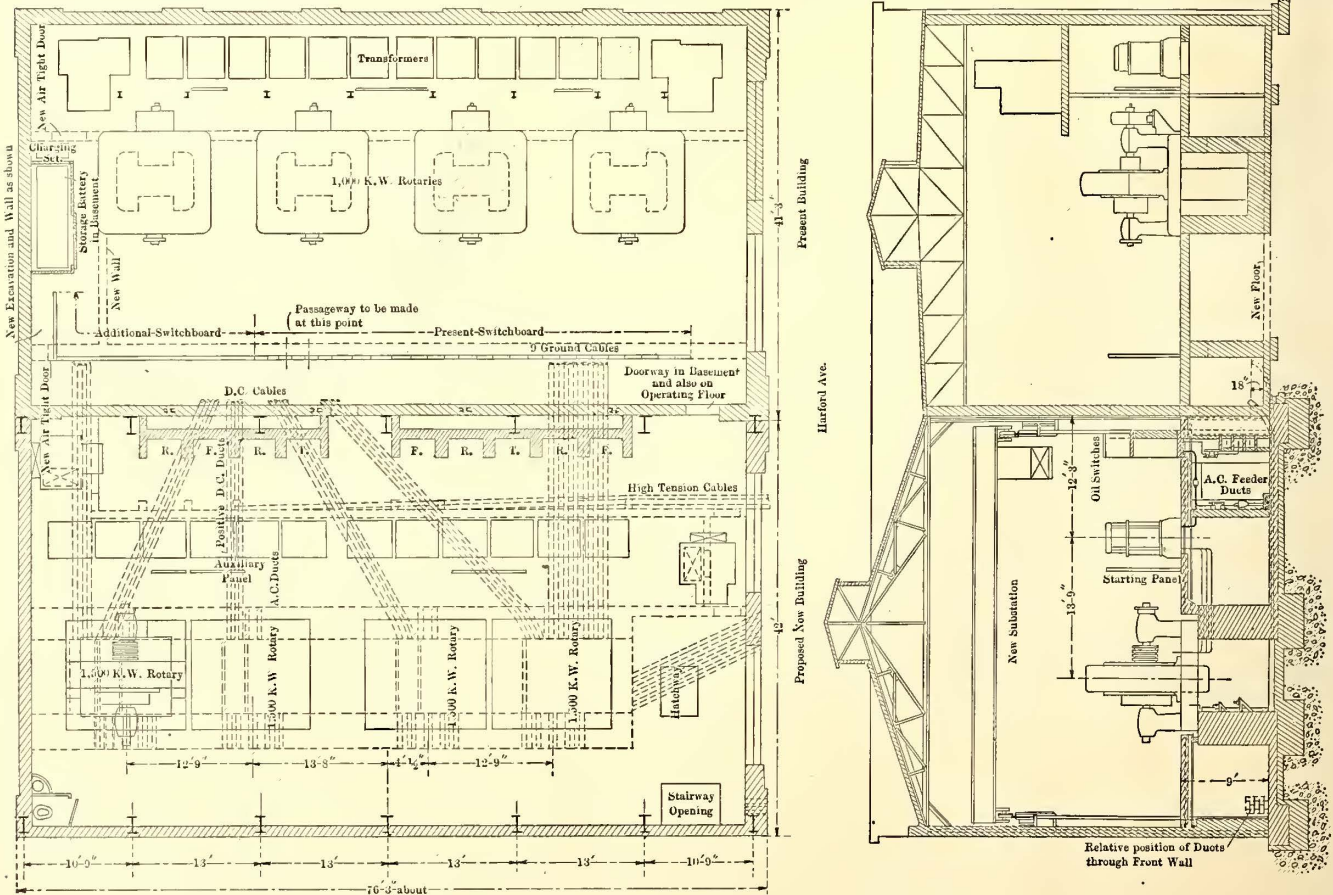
PLAN AND SECTION OF NORTHERN (NO. 2) SUBSTATION
